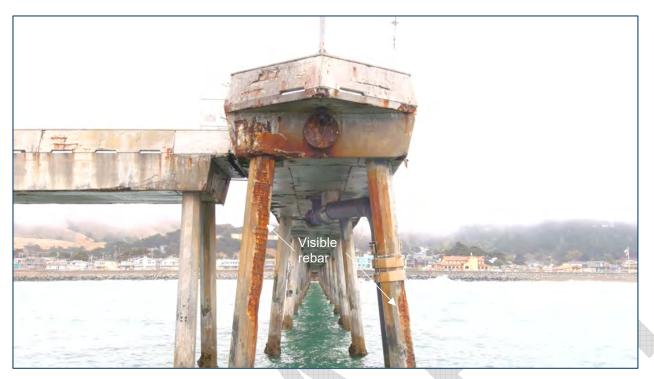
Deck Exterior at Bent 1R - West Face
